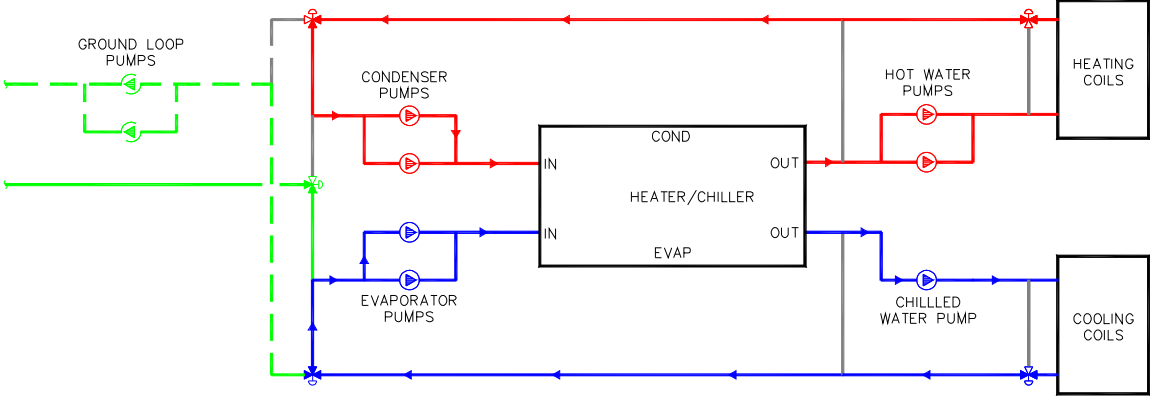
Central Geothermal Plant with Excess Heating Load (Absorbing Heat from the Ground)
